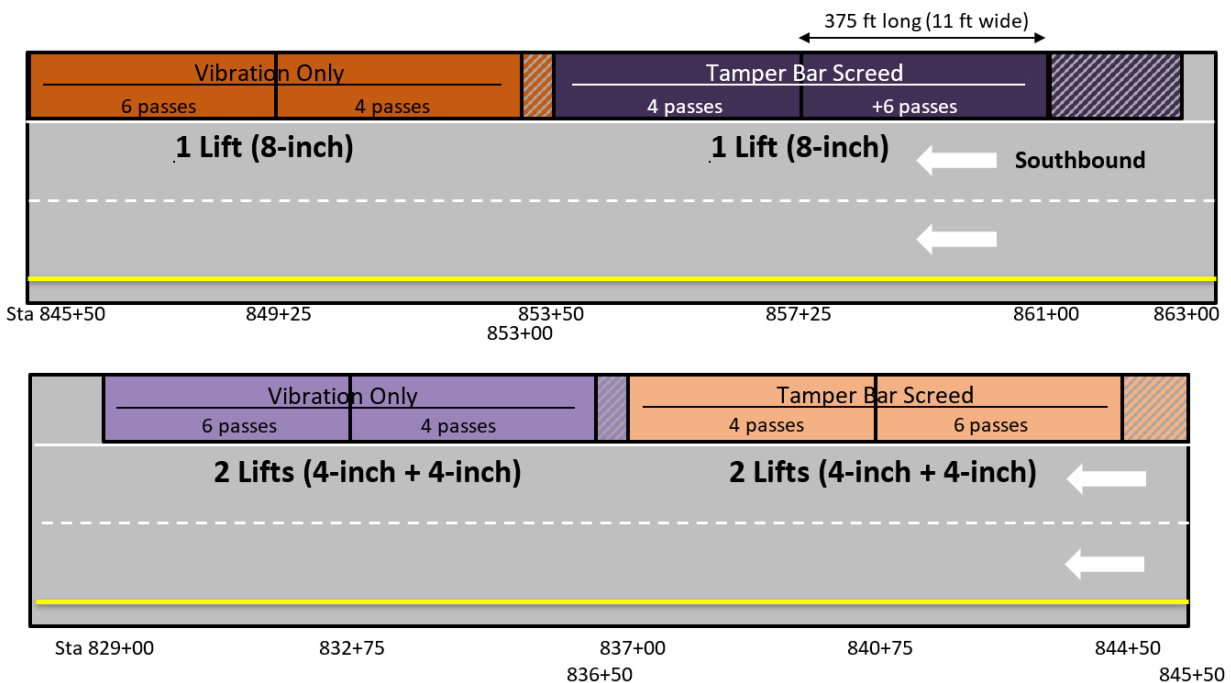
DAL-SH 121 Shoulder Test Section Layout.
